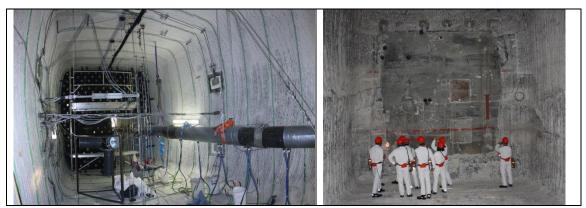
(left) Photo of the test site with installed sensors, closed circular grouting pips, cladding tube and partitioning plate and (right) Photo of the air side of the completed test structure (with boreholes to perform in situ measurements and to collect specimen for laboratory tests)
